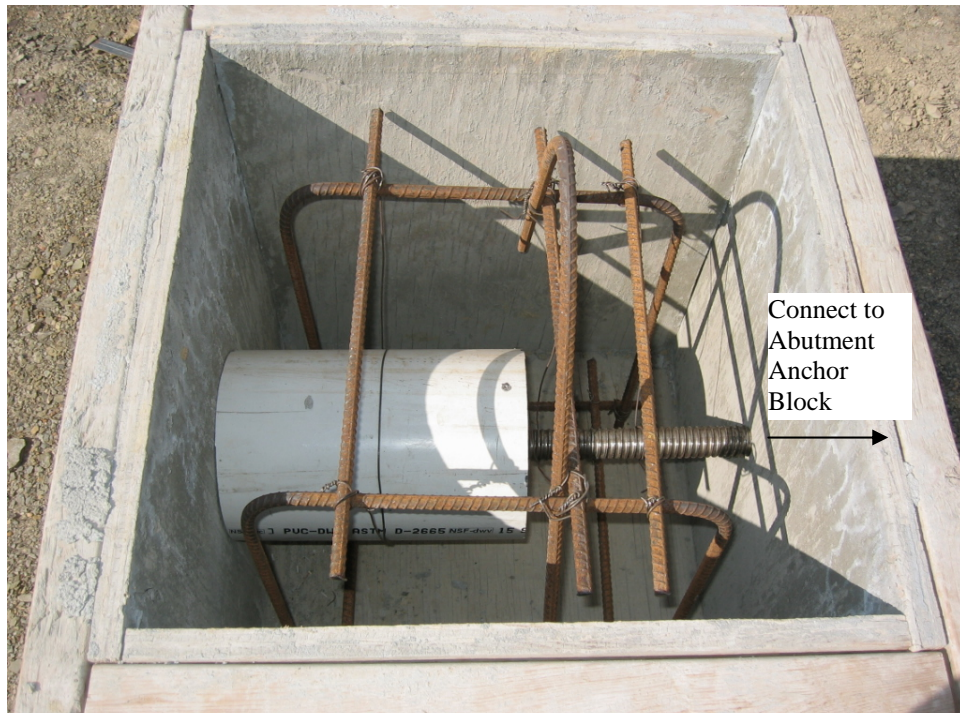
Photograph of Form Work of Concrete Block for Extensometer
